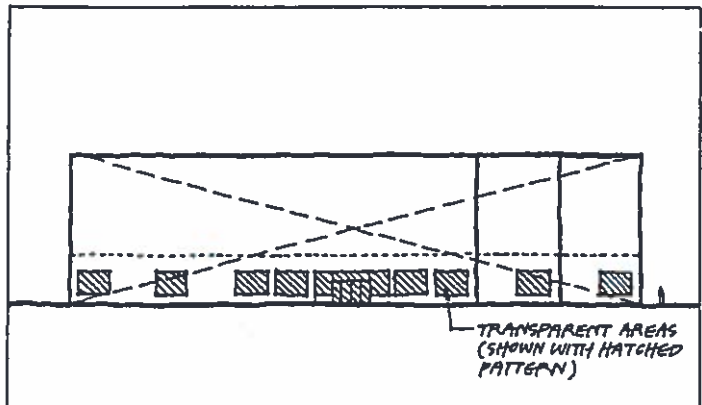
C EXAMPLE SHOWING THE ENTIRE SUGGESTED MINIMUM TRANSPARENT AREA ALLOCATED TO THE GROUND FLOOR FAÇADE.
